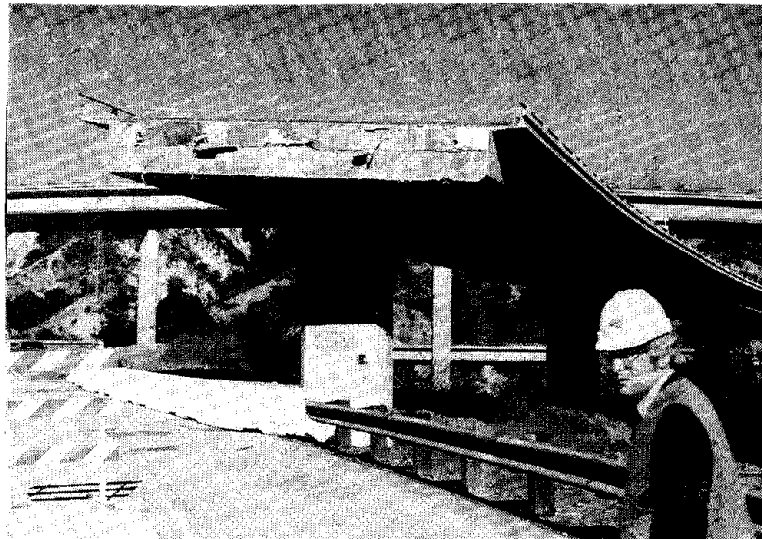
Failure of Cable restrainers at a Joint near P4
